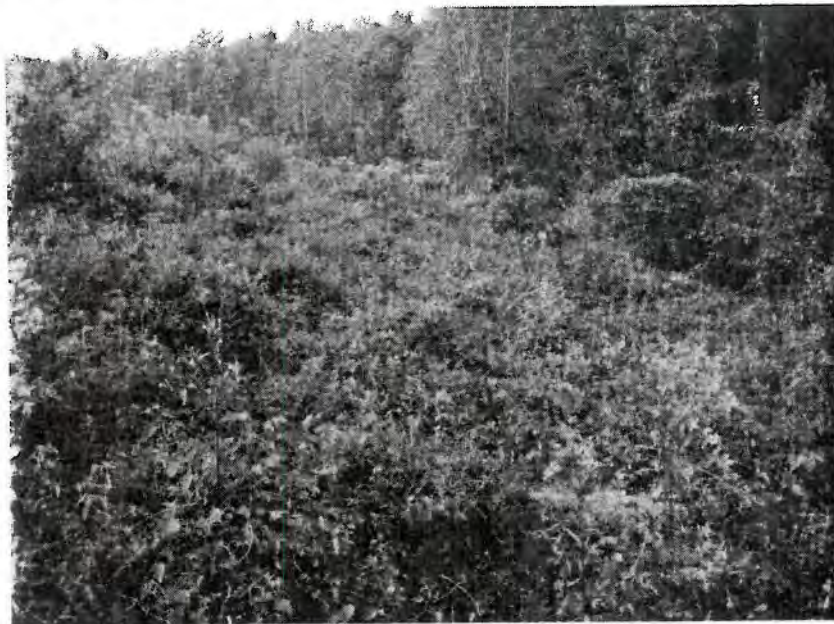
Photo of Embankment Outside Slope View – East side of ash pond dike looking north.
